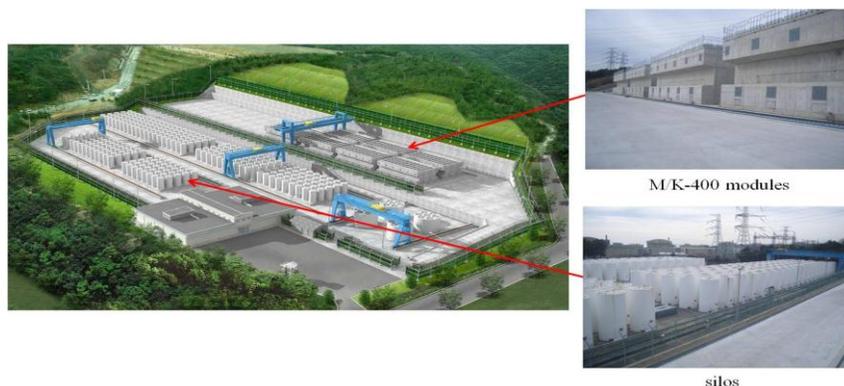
Dry storage facility for CANDU spent fuel at Wolsong site
